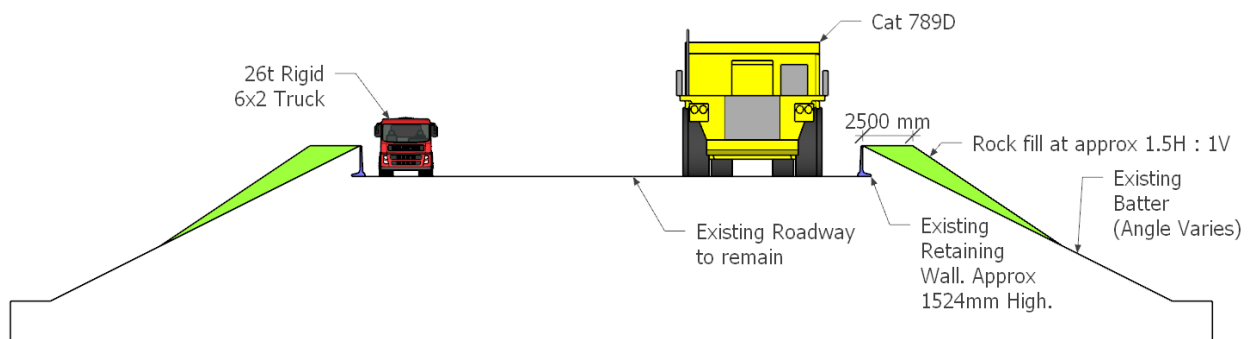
Typical cross section of proposed causeway barrier upgrade
